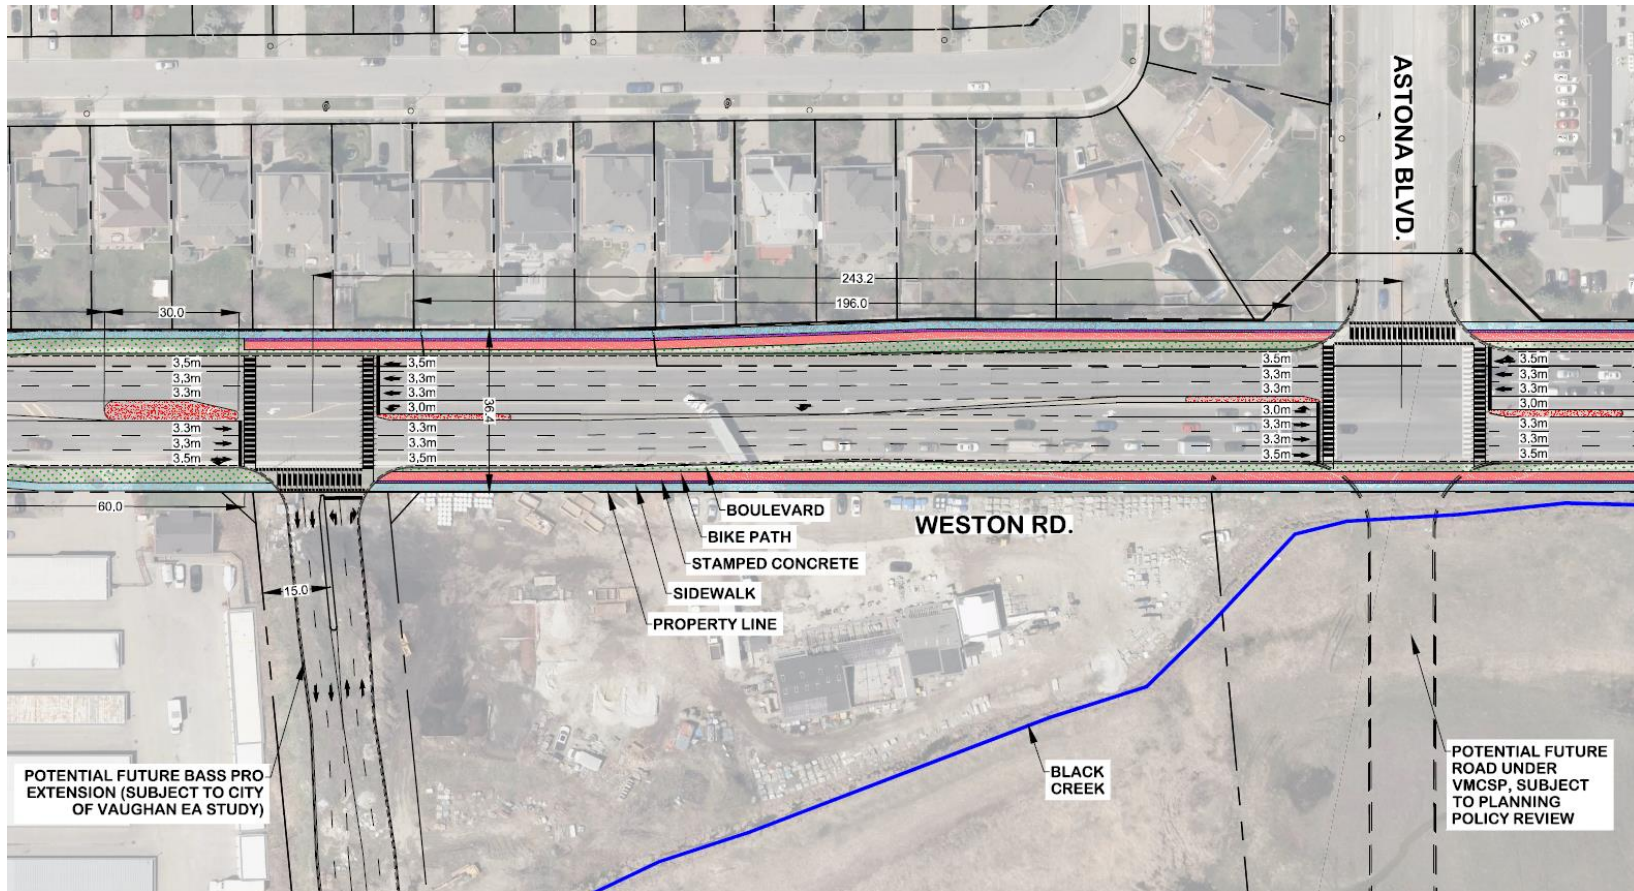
Weston Road segment between proposed Bass Pro Mills Drive Extension and Astona Boulevard
